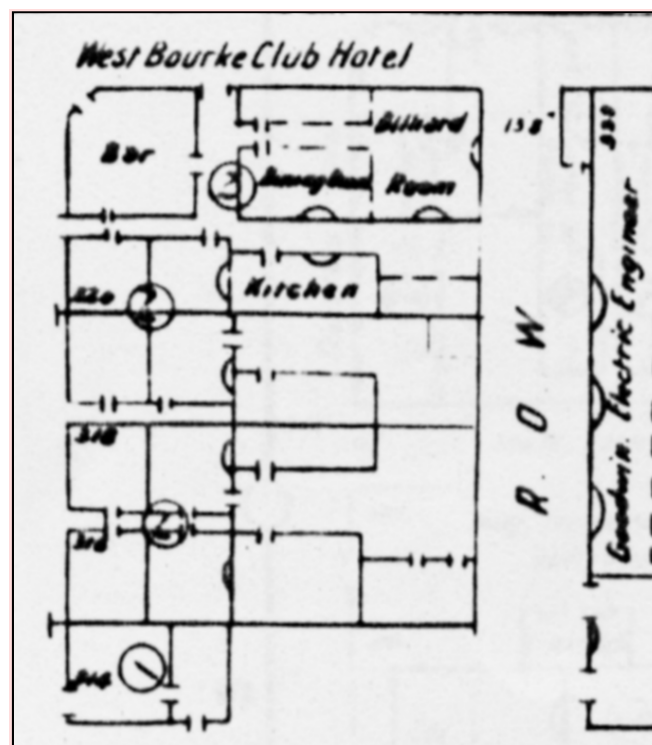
Mahlstedt's fire insurance plans dated at c1925-1928 (State Library of Victoria) show the hotel as 3 levels as an amendment to the 1925 base plan, with original subdivision of corner bar, billiard and dining rooms and kitchen, plus adjoining house sold in 1919-1920 sales.
